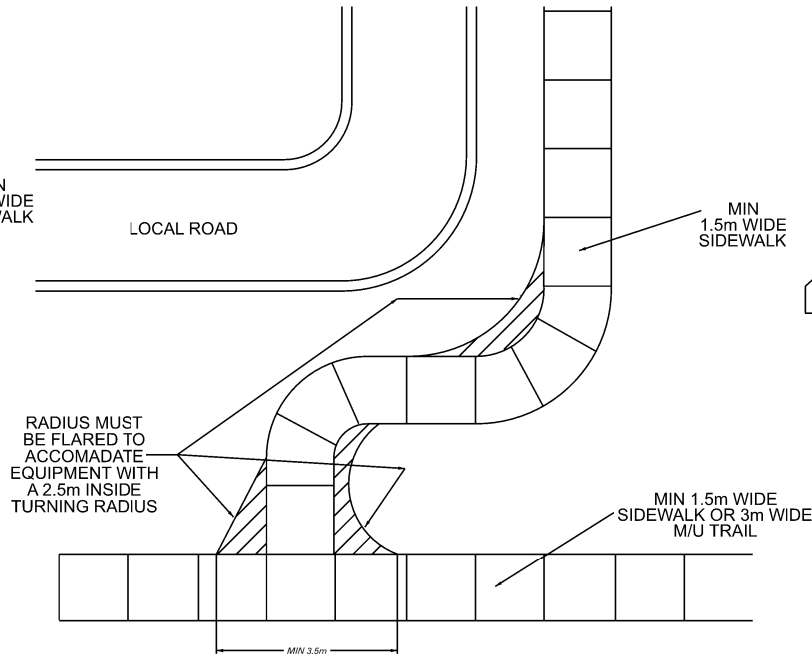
ALTERNATIVE LOCAL SIDEWALK CONNECTION TO SIDEWALK OR MULTI-USE TRAIL ON ARTERIAL OR COLLECTOR ROADS TO ADDRESS GRADE ISSUES
